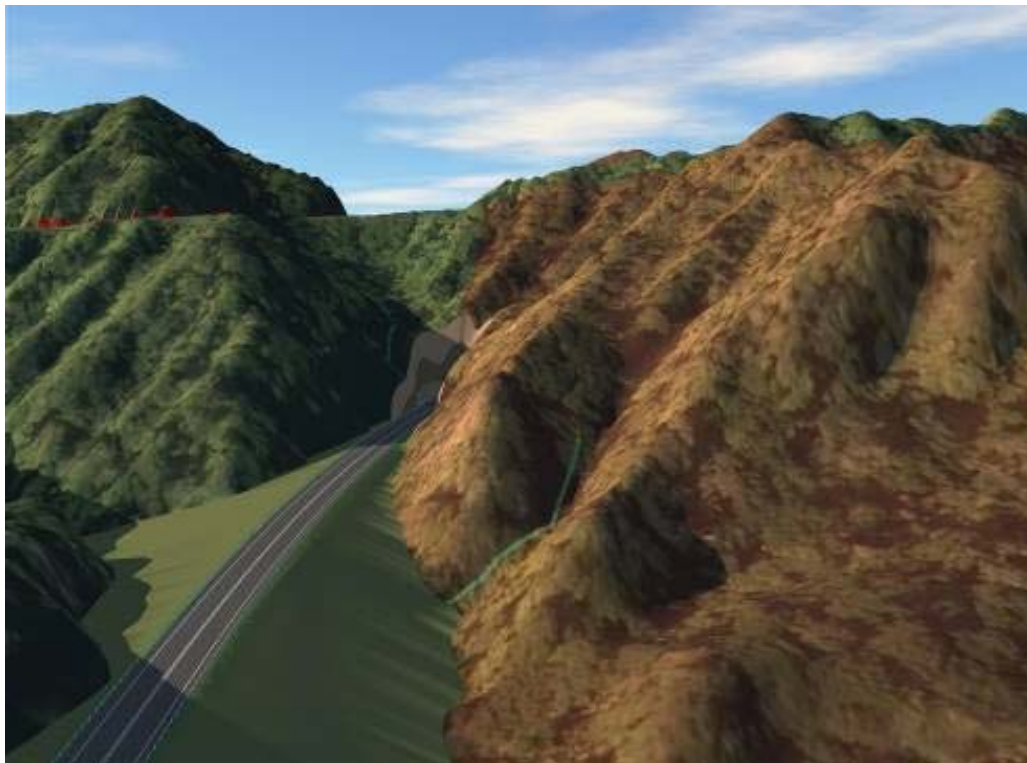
View of the proposed road corridor looking south up the Mangapepeke Valley.
